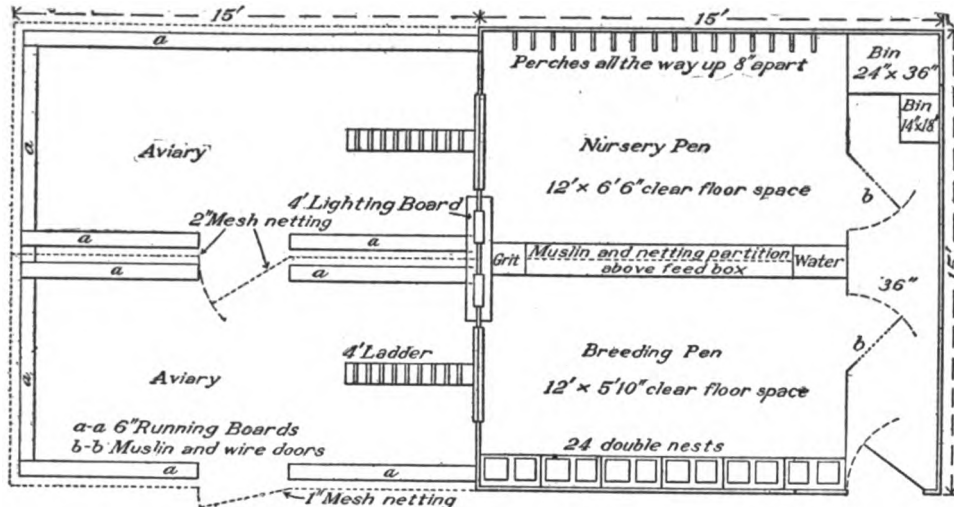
Plan of double house and pens, *a* run; *b* doors. For construction of perches see Figs. 282 and 285; and of nest boxes see Fig. 283
